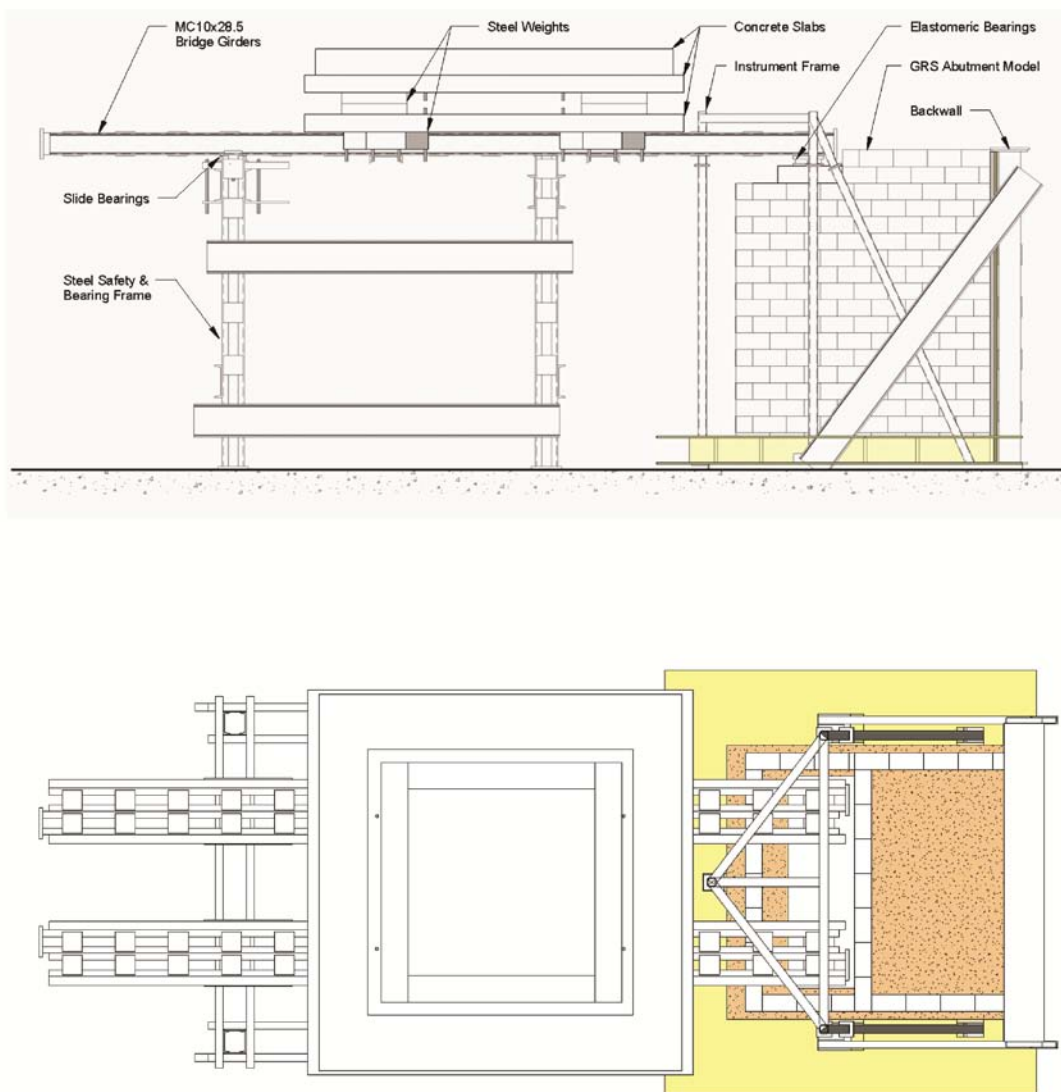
Configuration of the Full-Scale Shake Table Test of a GRS Abutment-Bridge System
